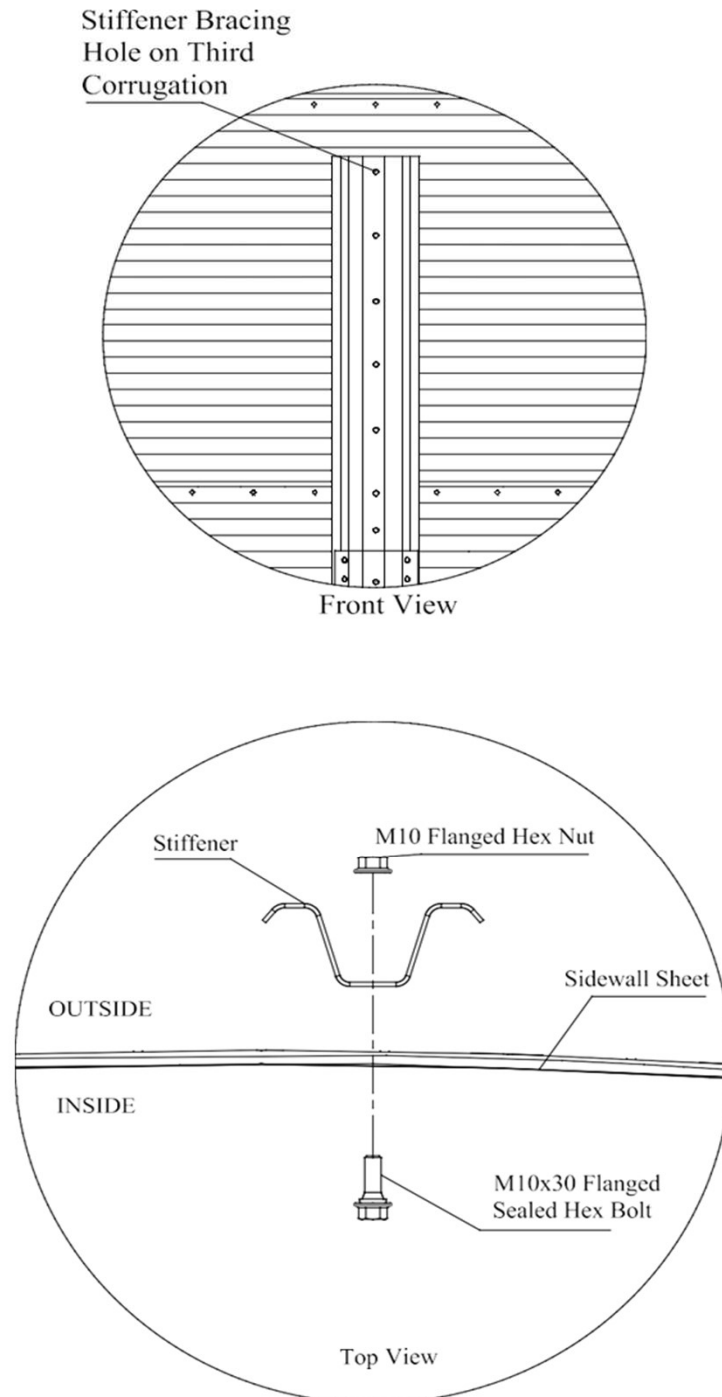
Odd Ring Silo Top Ring Detail
